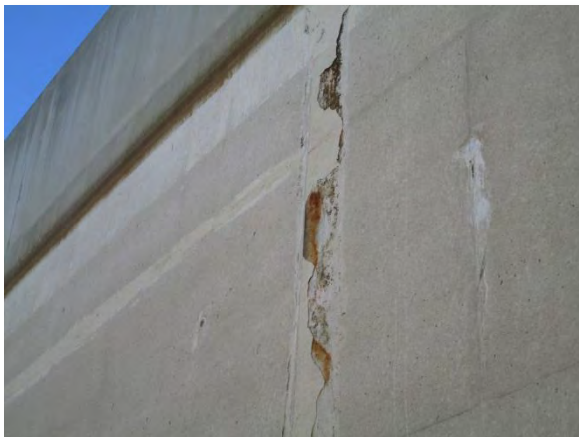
Corrosion staining at construction joint on east wall. There may have been a metal strip embedded in the surface of the concrete.
